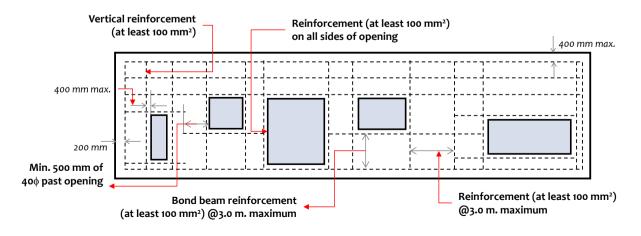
REQUIREMENTS OF MINIMUM REINFORCEMENT IN MASONRY WALLS (RMB 1)
